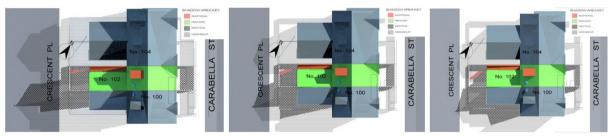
Shadow Diagrams at 9.00 am (left), 10am (centre) and 11.00 am (right) detailing shadow cast from the dormer affecting the roof of the attached dwelling (SD02-04 Rev 01)
